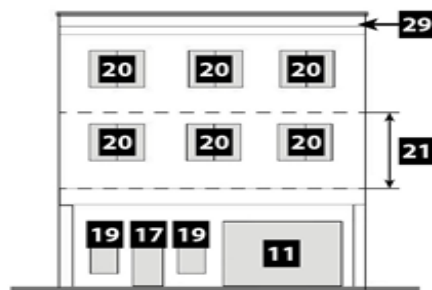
Limited Bay Building Street Facade DiagramFigure 6.02c. Limited Bay Building Height and Use DiagramD. Row Building.1. Intent.
